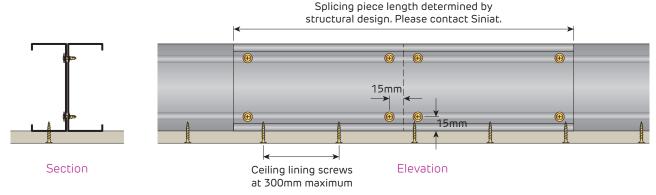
Splicing Steel Ceiling Studs via Back-to-back Method
